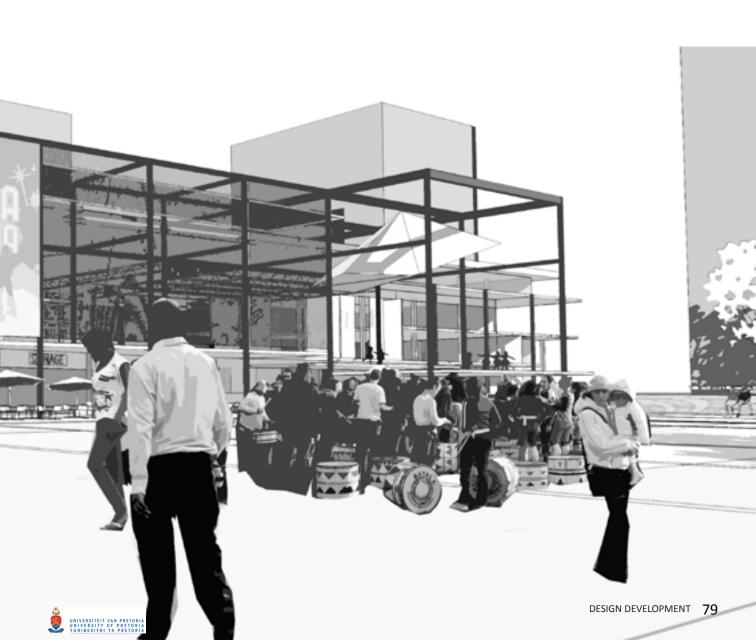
Proposal 4: View of new extention from the corner of Church and Van der Walt Street
